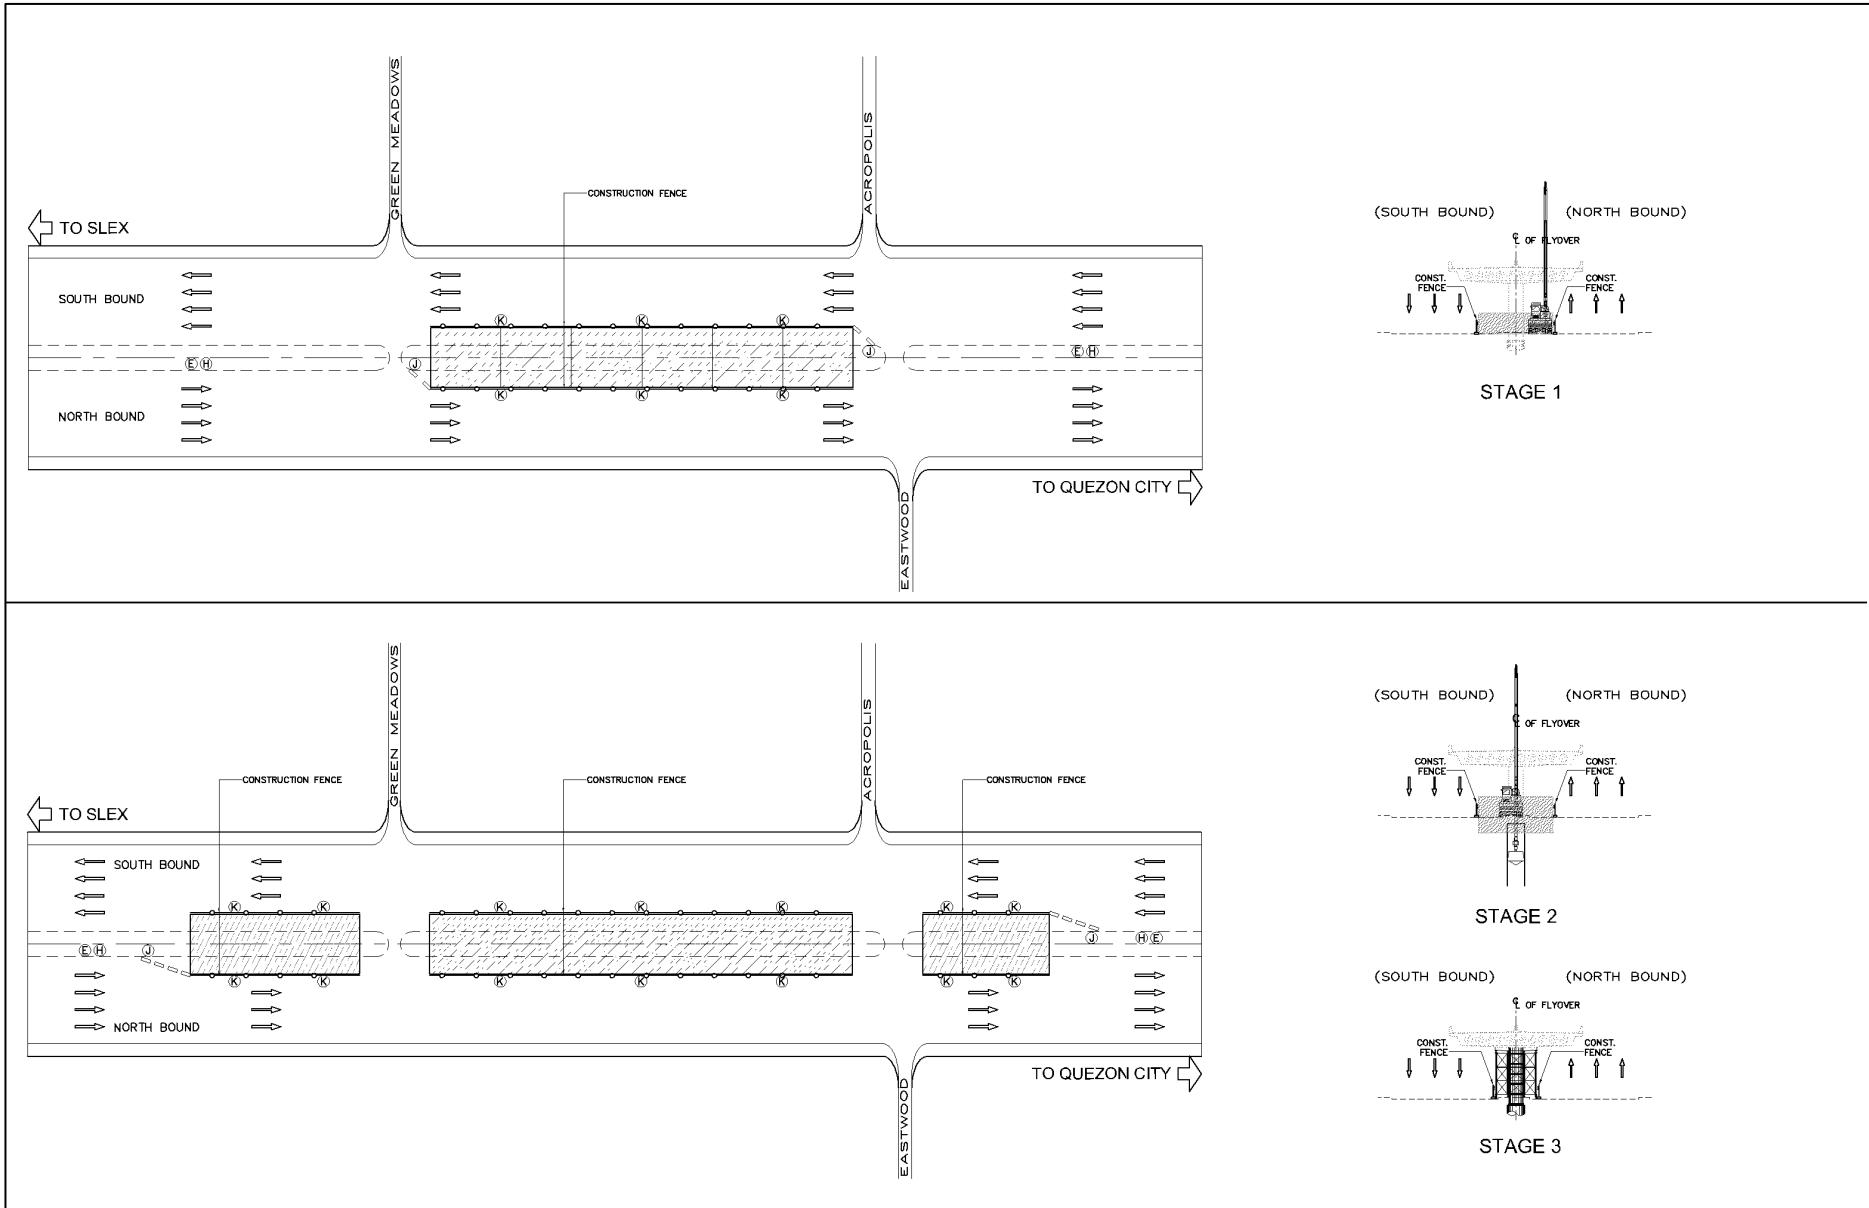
Construction Plan for C-5/Green Meadows Interchange (2/2)
